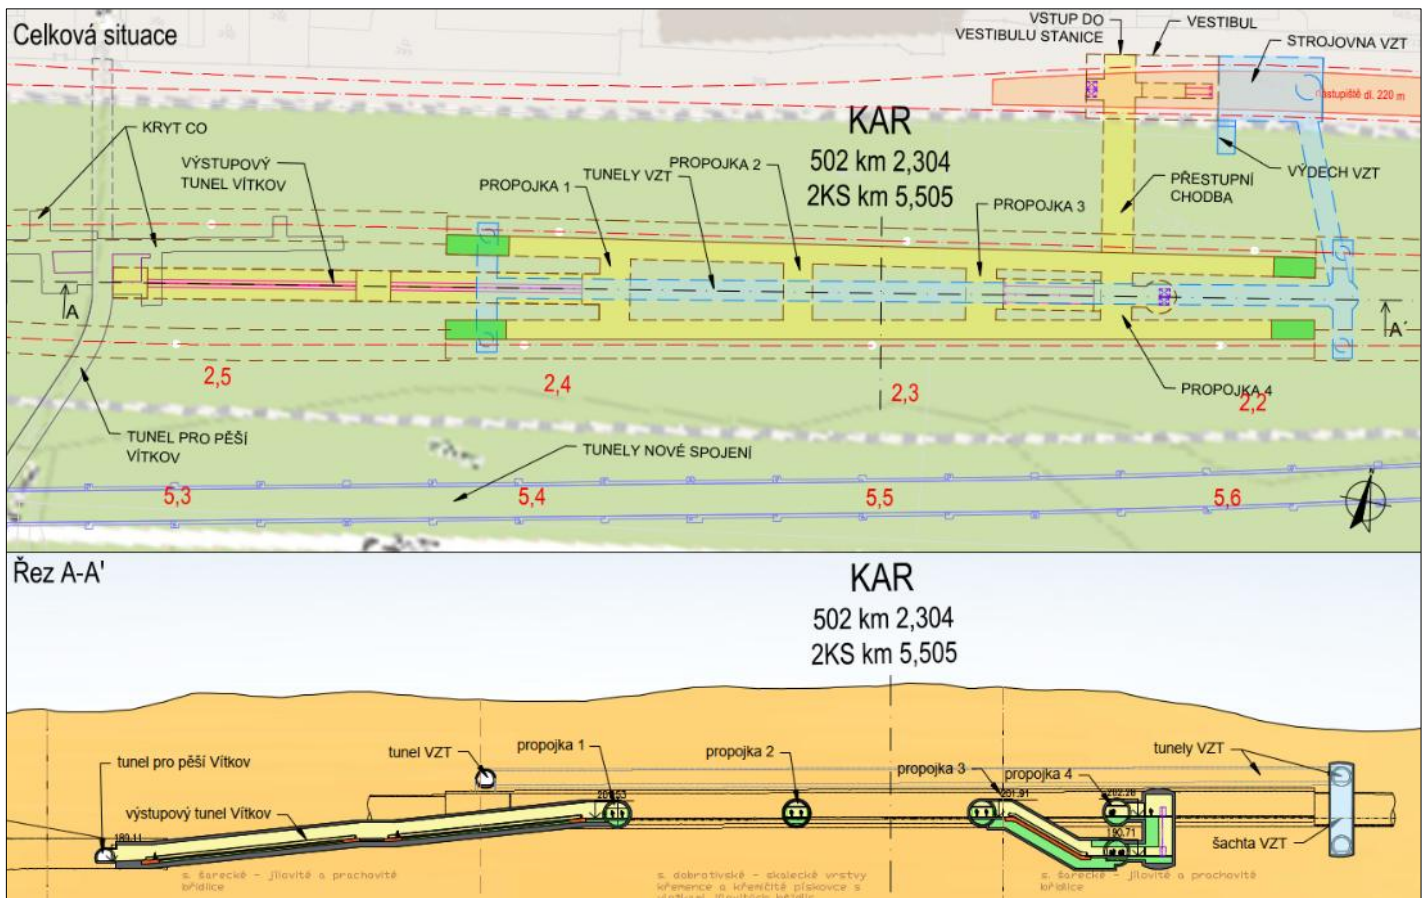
Layout and longitudinal plan of Karlín station. Source: Mott Mac Donald CZ, spol. s.r.o.
